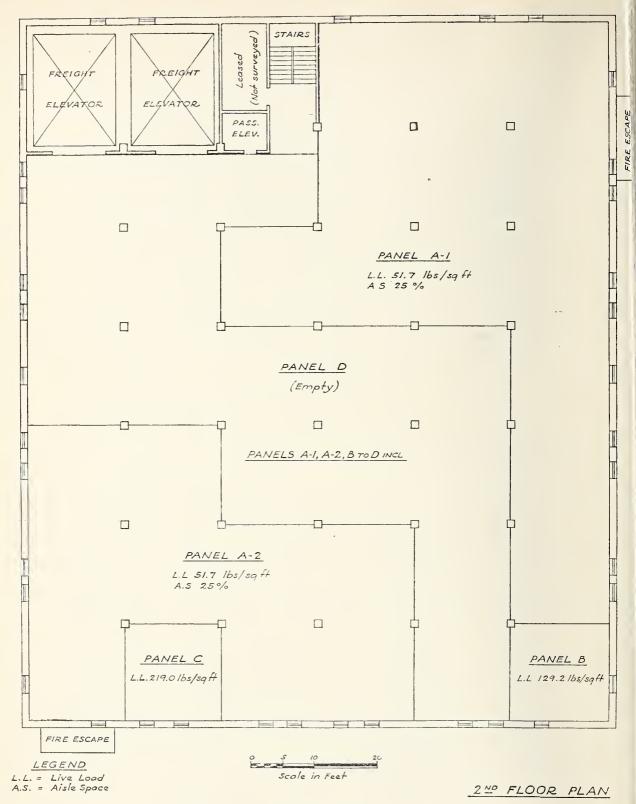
Second-floor plan, warehouse, Washington, D. C.
